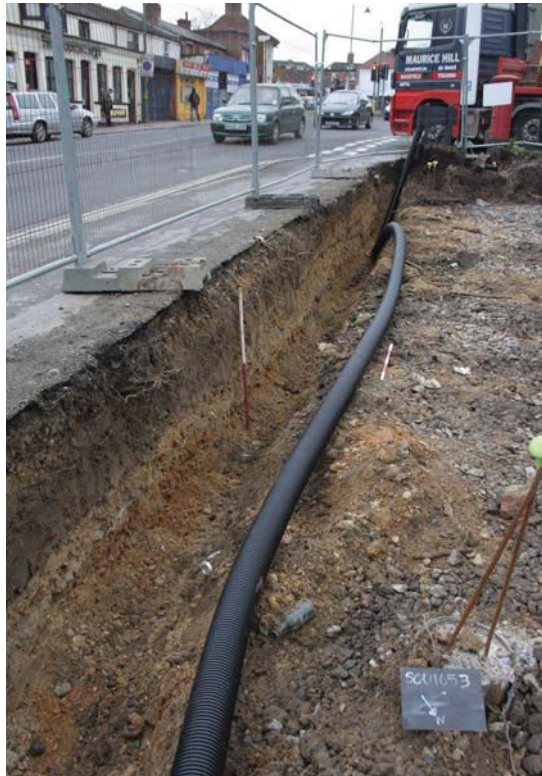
Site section against road edge, looking looking south west, Scales: 1m and 0.5m.
